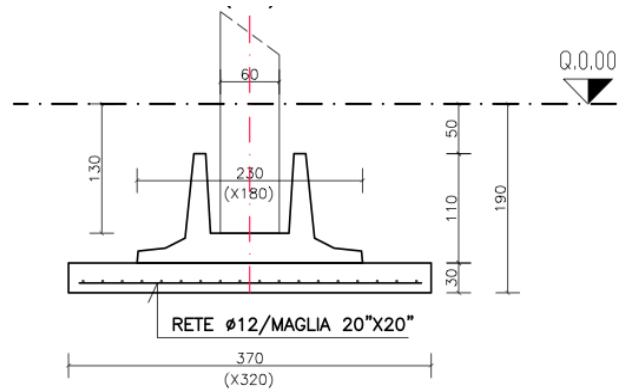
Sleeve-footing on reinforce concrete sub-foundation.
